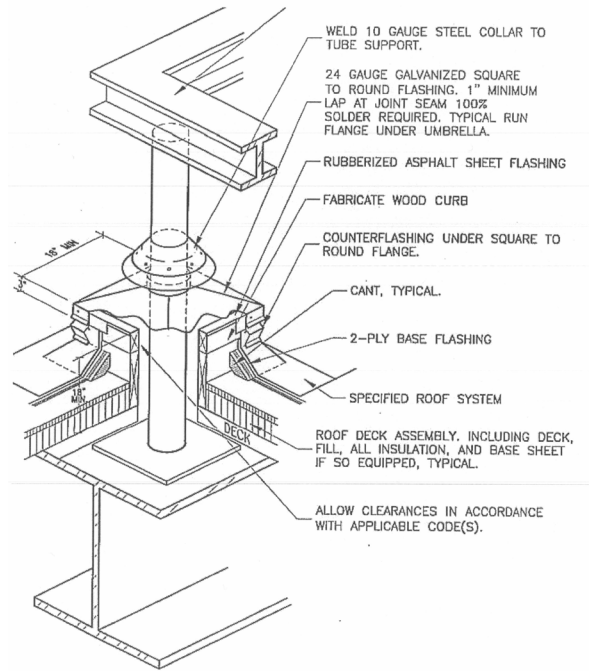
TYPICAL ROOF SUPPORT DETAIL FOR ELEVATED PLATFORM
